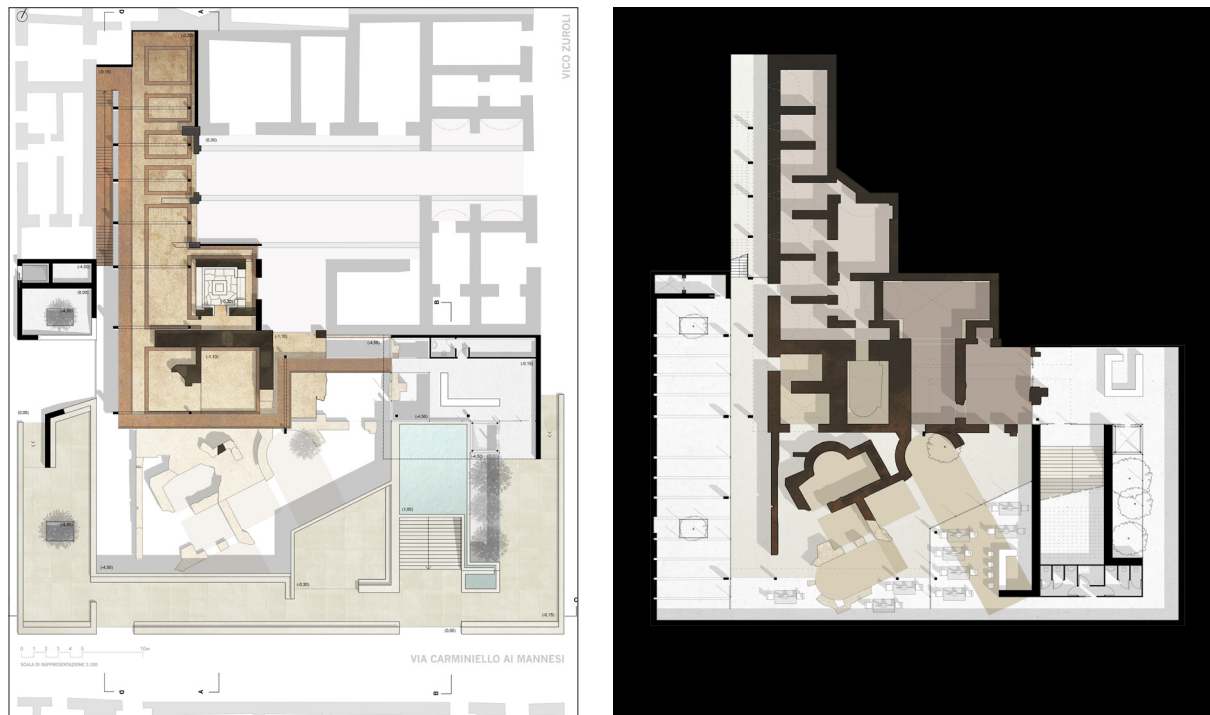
Project plan at the city's ground level and project plan at the level of the archaeological excavation.
